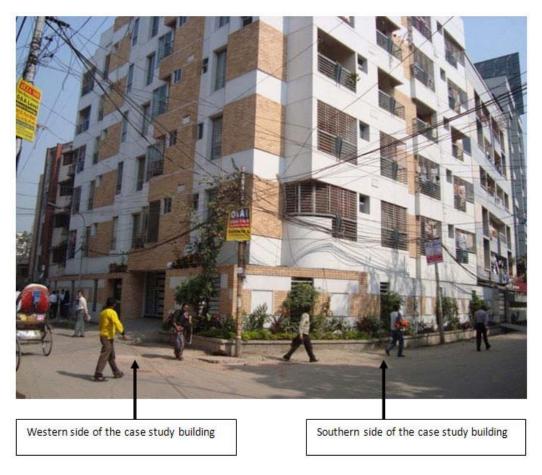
Two fifty feet width roads flanked on the western and southern side of the case study building
